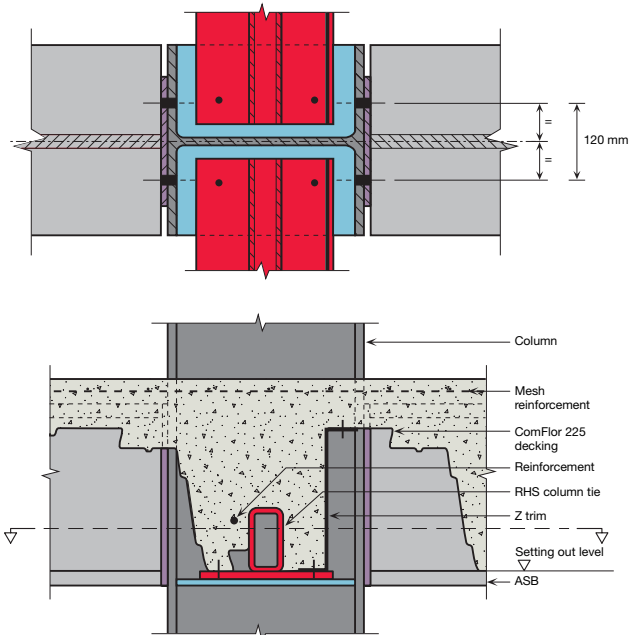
RHS tie with welded deck support plate and cut decking
